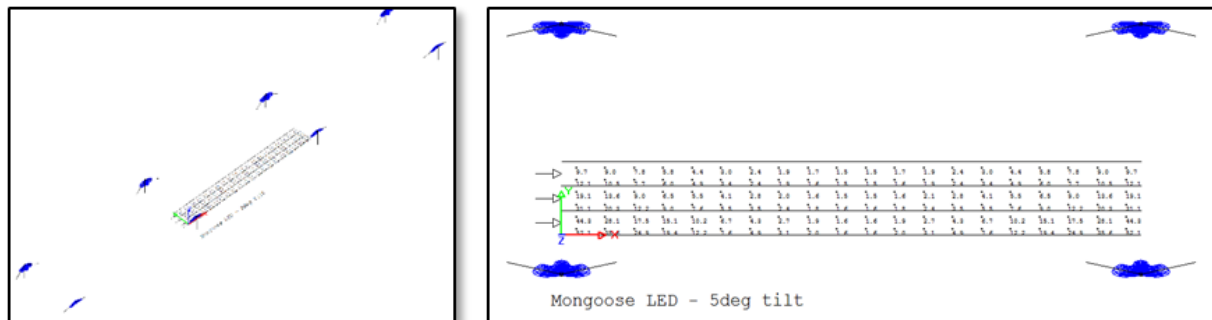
Example lighting calculation for the SSP West section, with poles spaced 284 ft apart.
